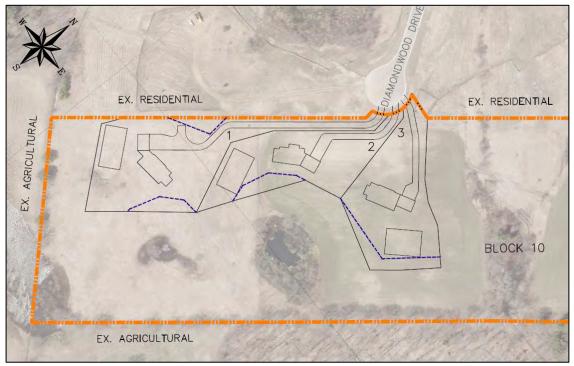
Revised Proposed Driveway Configuration for Lots 1-3
